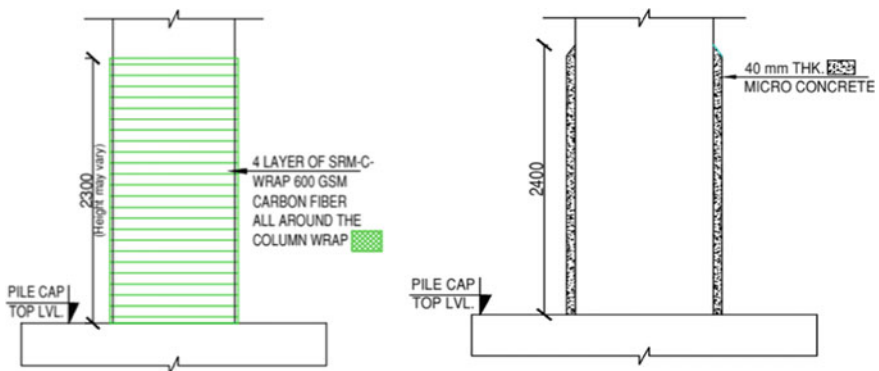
Schematic sketches of retrofitting scheme to be applied on the piers
